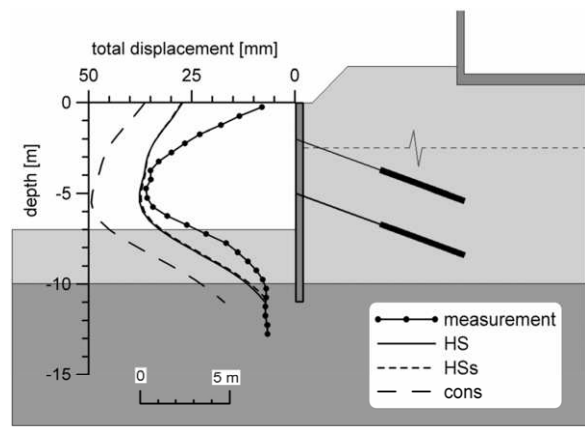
Anchored retaining wall No. 3 at site B: layout and horizontal displacements
